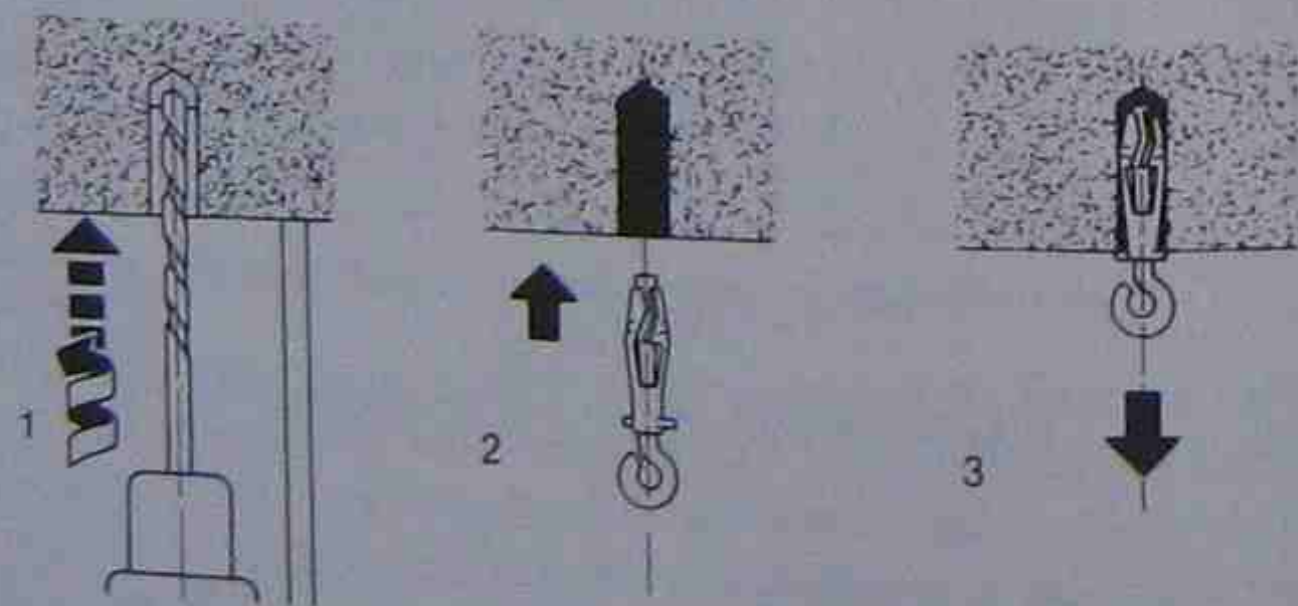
Hilti HA8 R1 suspension anchor setting diagrams
